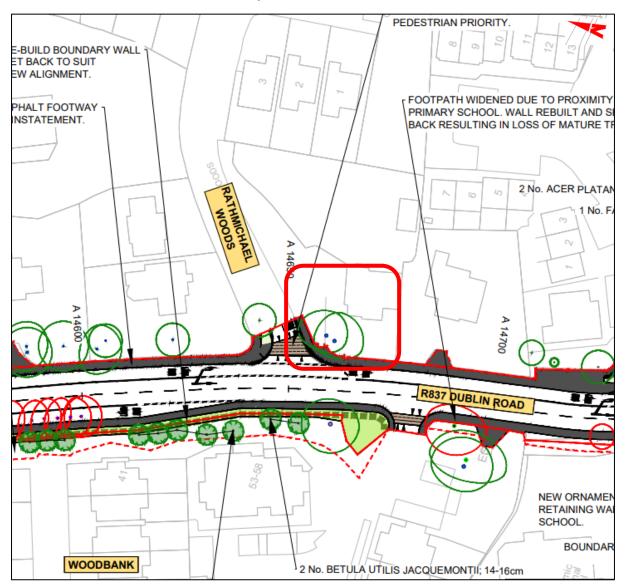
Extract from Landscape General Arrangement Drawings (Sheet 42)
